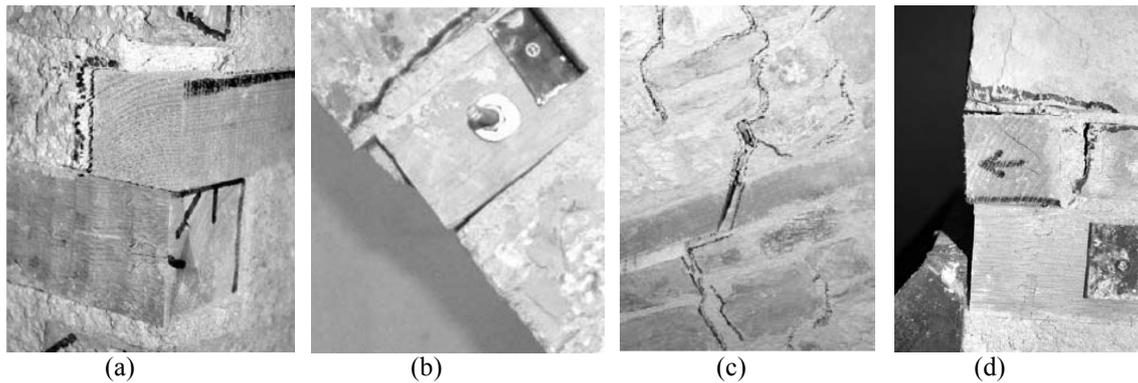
Details of crack pattern, (a) wallette 5, (b) wallette 6, (c) wallette 7, (d) wallette 8.
